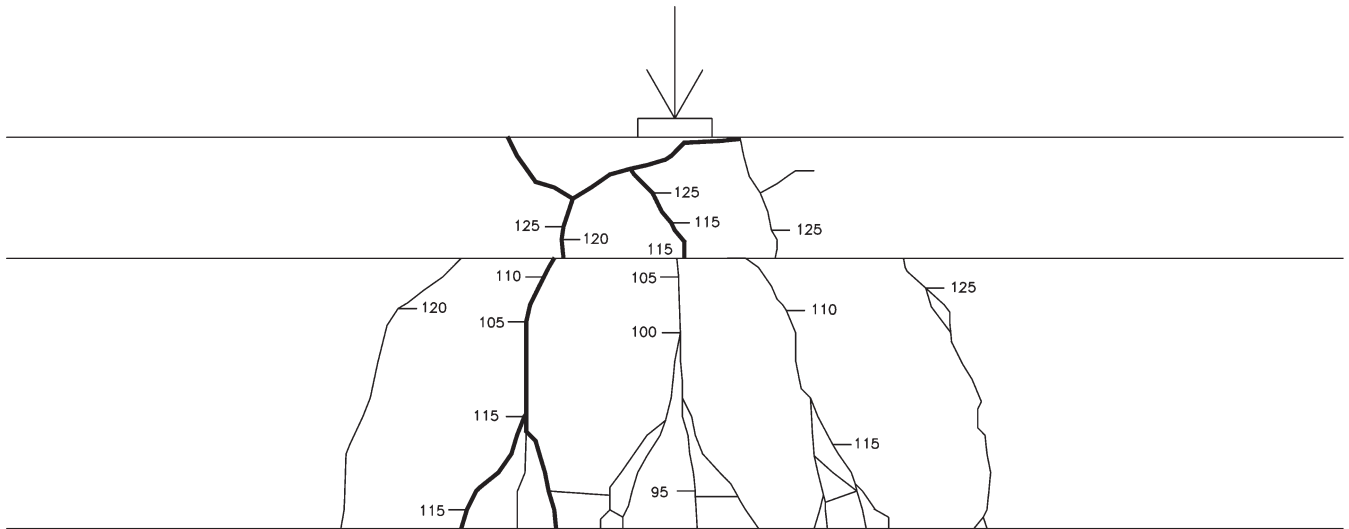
Crack patterns at failure of multiple-strand development length specimen HPC-2 (south face).
